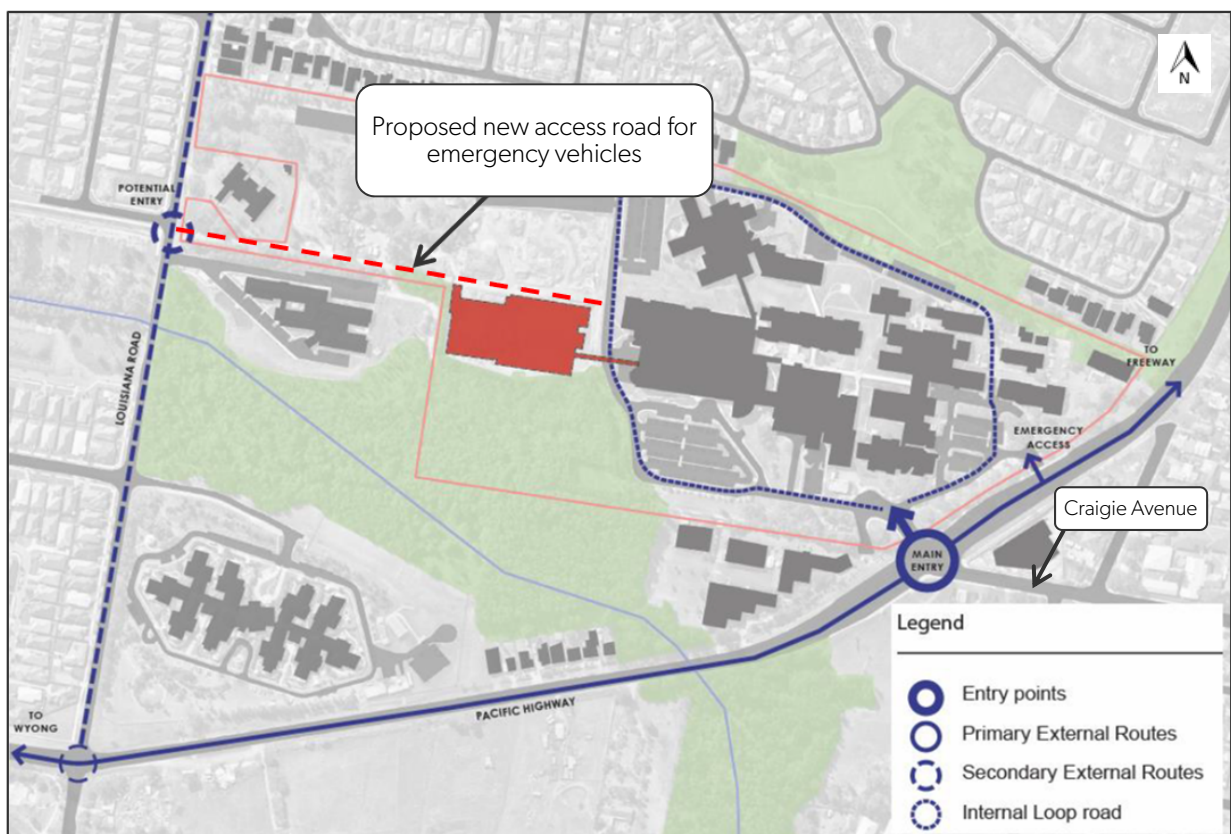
| Existing and proposed access arrangements (Source: Applicant's RtS)
